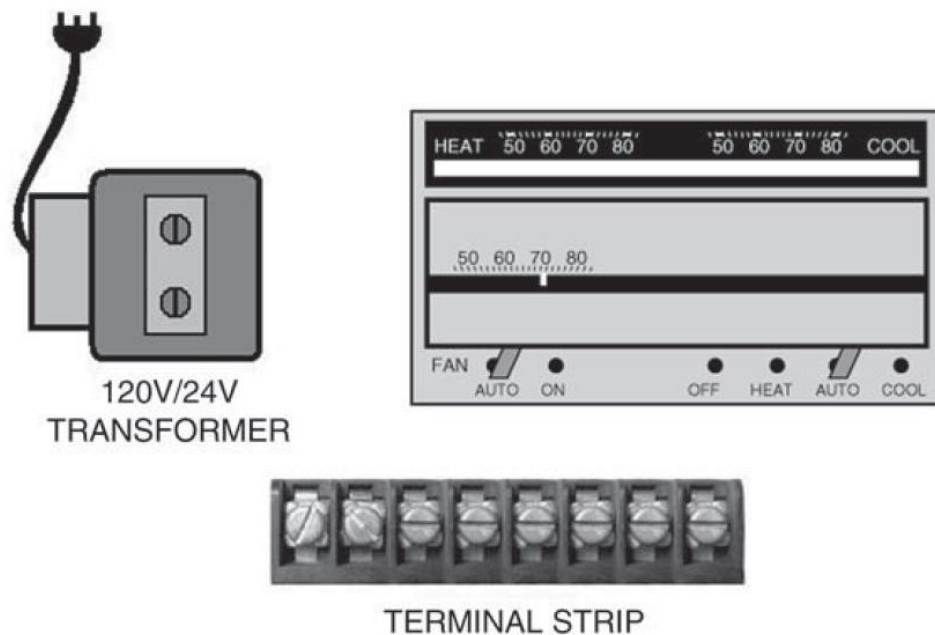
■ Transformer, Thermostat, and Terminal Strip Layout
